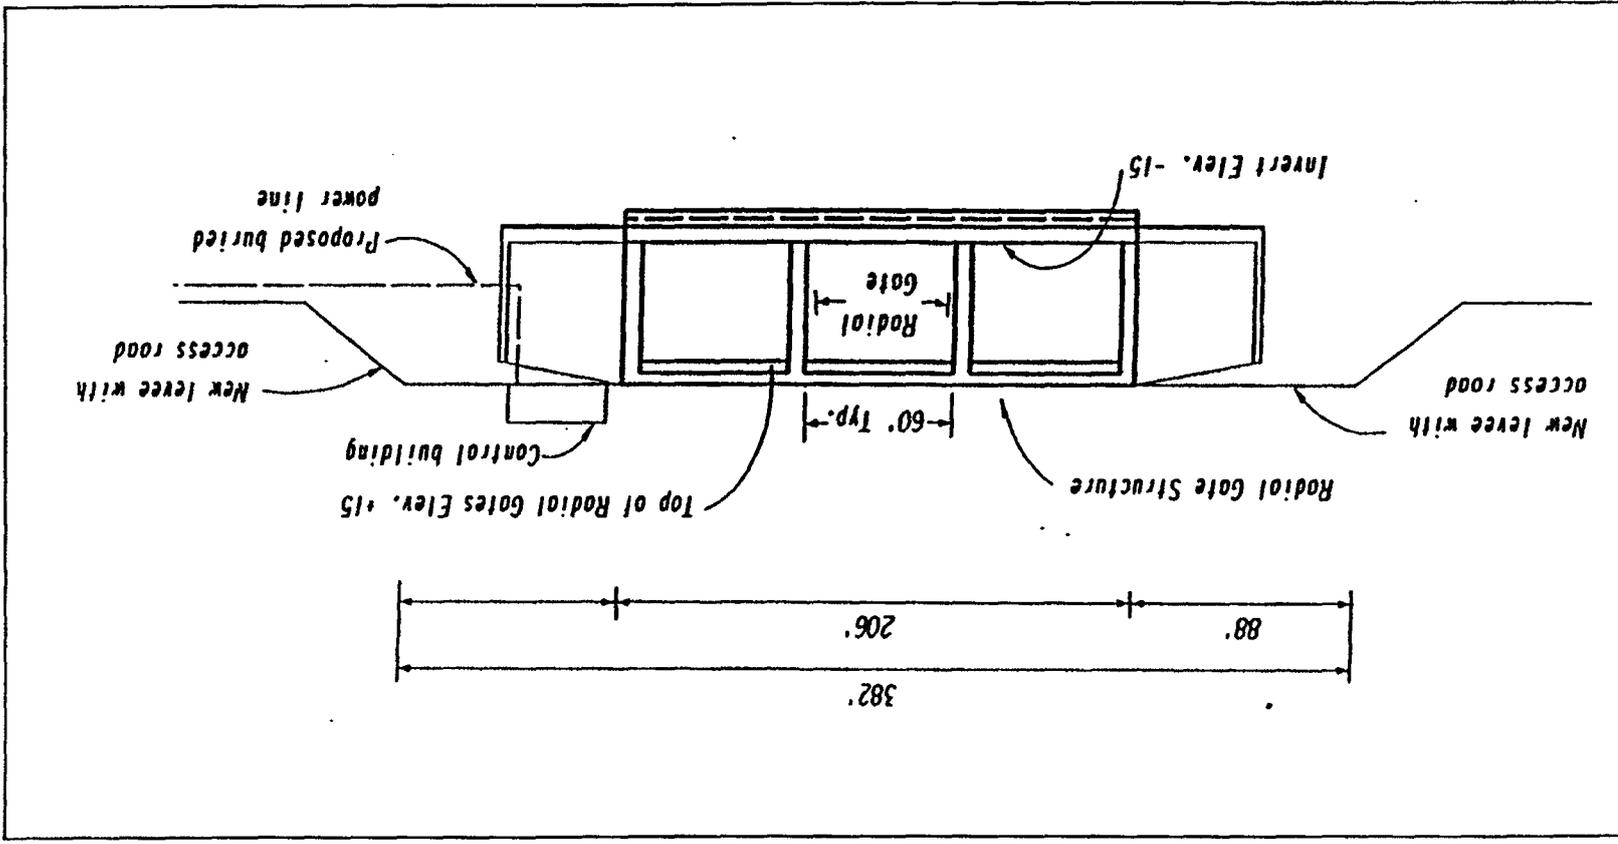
ELEVATION VIEW - Delta Cross Channel 3-Gate Enlargement
